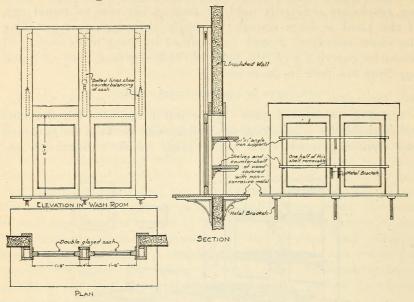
Detail of transfer window between breaking and sterilizing rooms. Be sure to build the weight boxes on the sterilizing room side of the partition.
